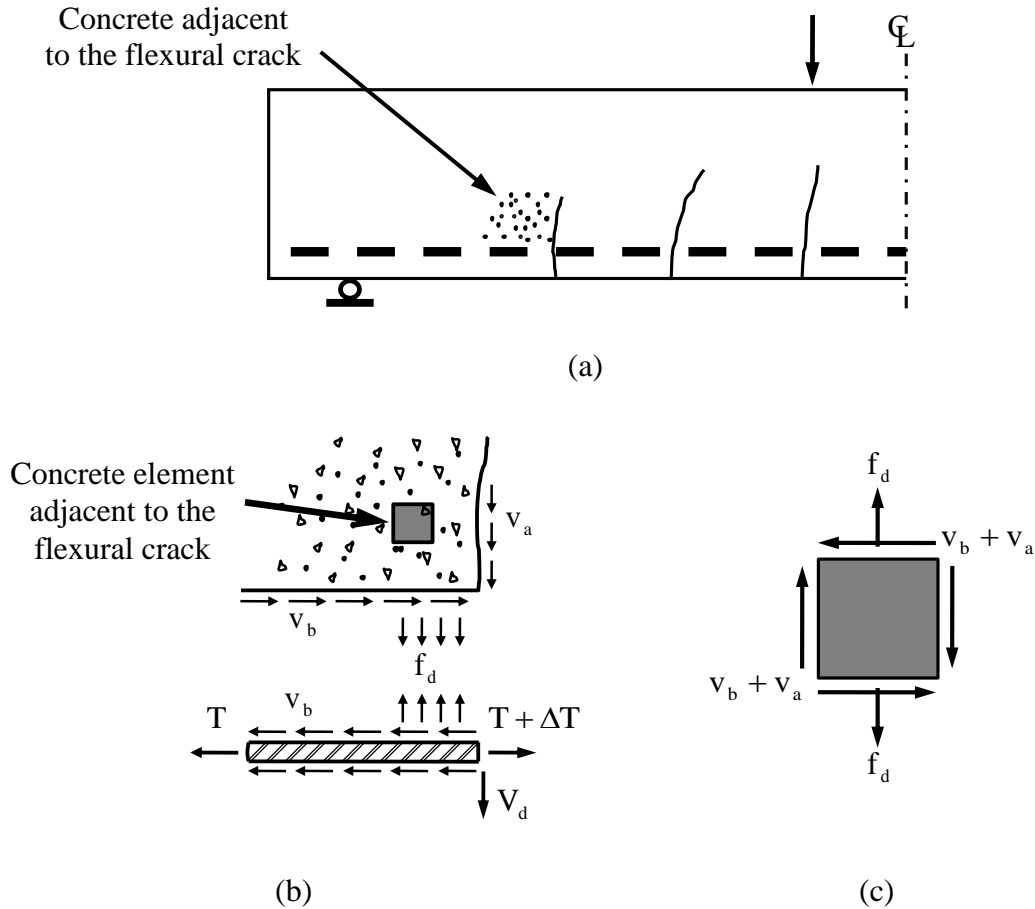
Stress state adjacent to a flexural crack in a shear span: (a) reinforced concrete flexural member subjected to four-point loading, (b) stresses on concrete and the reinforcing steel adjacent to a flexural crack, and (c) stress state of a concrete element adjacent to the flexural crack (after Kim 1987).
